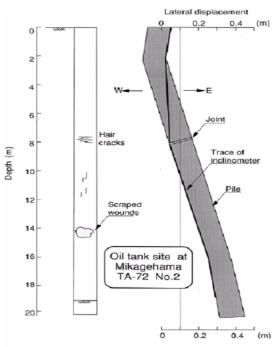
Lateral displacement and observed cracks on the inside wall of Pile No.2 Kobe 1995 EQ
